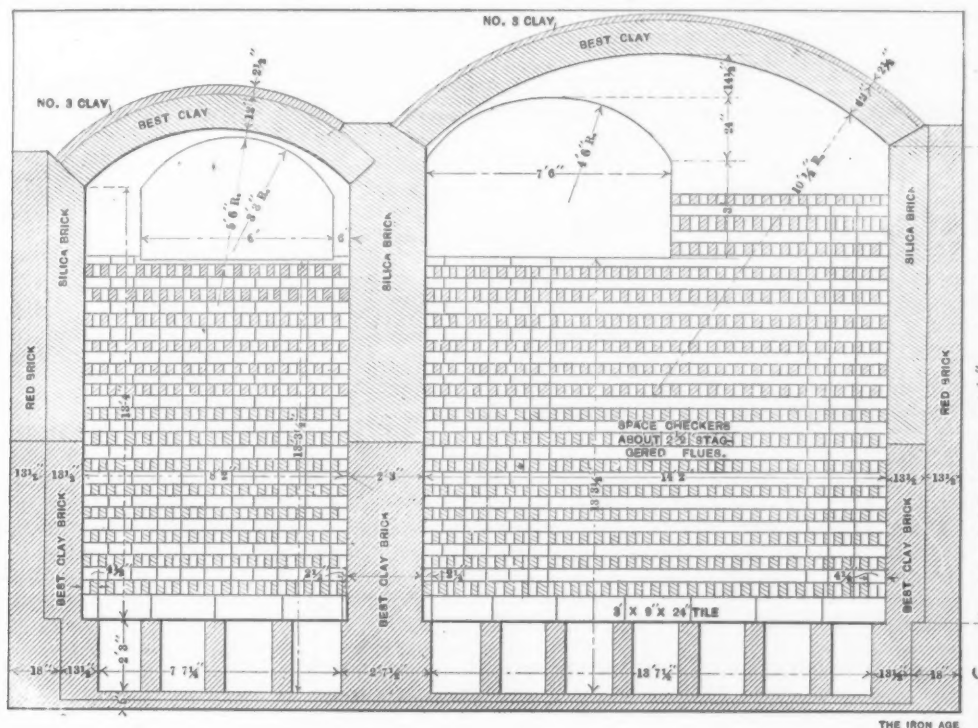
A Section through the Regenerators of One of the New Open Hearth Furnaces.
